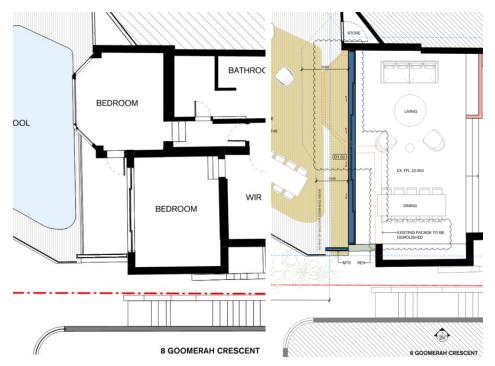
Extract of existing arrangement between lower ground floor plan and 8 Goomerah (Source: Tzannes) Extract of proposed arrangement between lower ground floor plan and 8 Goomerah (Source: Tzannes)
